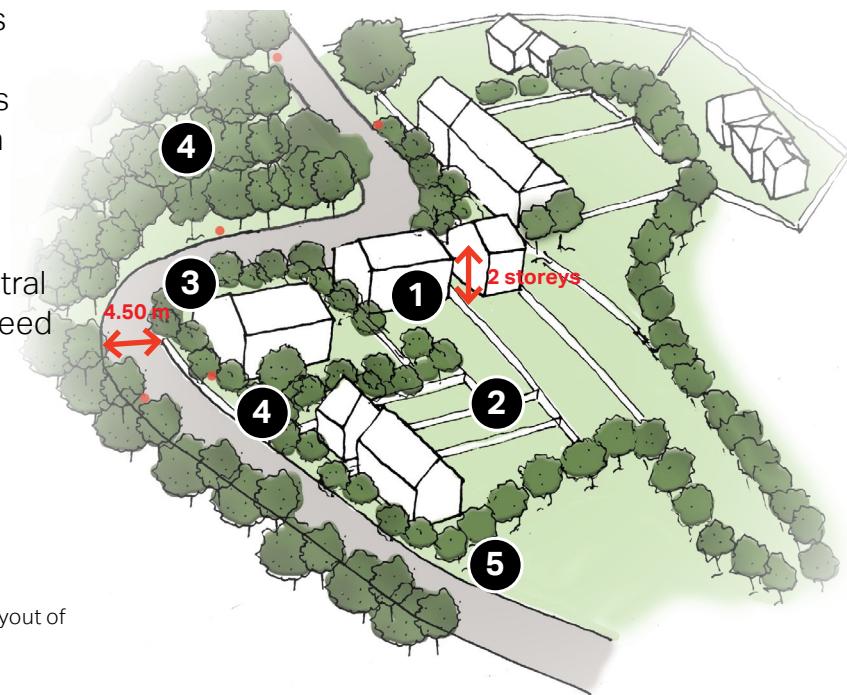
Illustrative plan for a rural edge development highlighting design elements, related to the pattern and layout of buildings.
